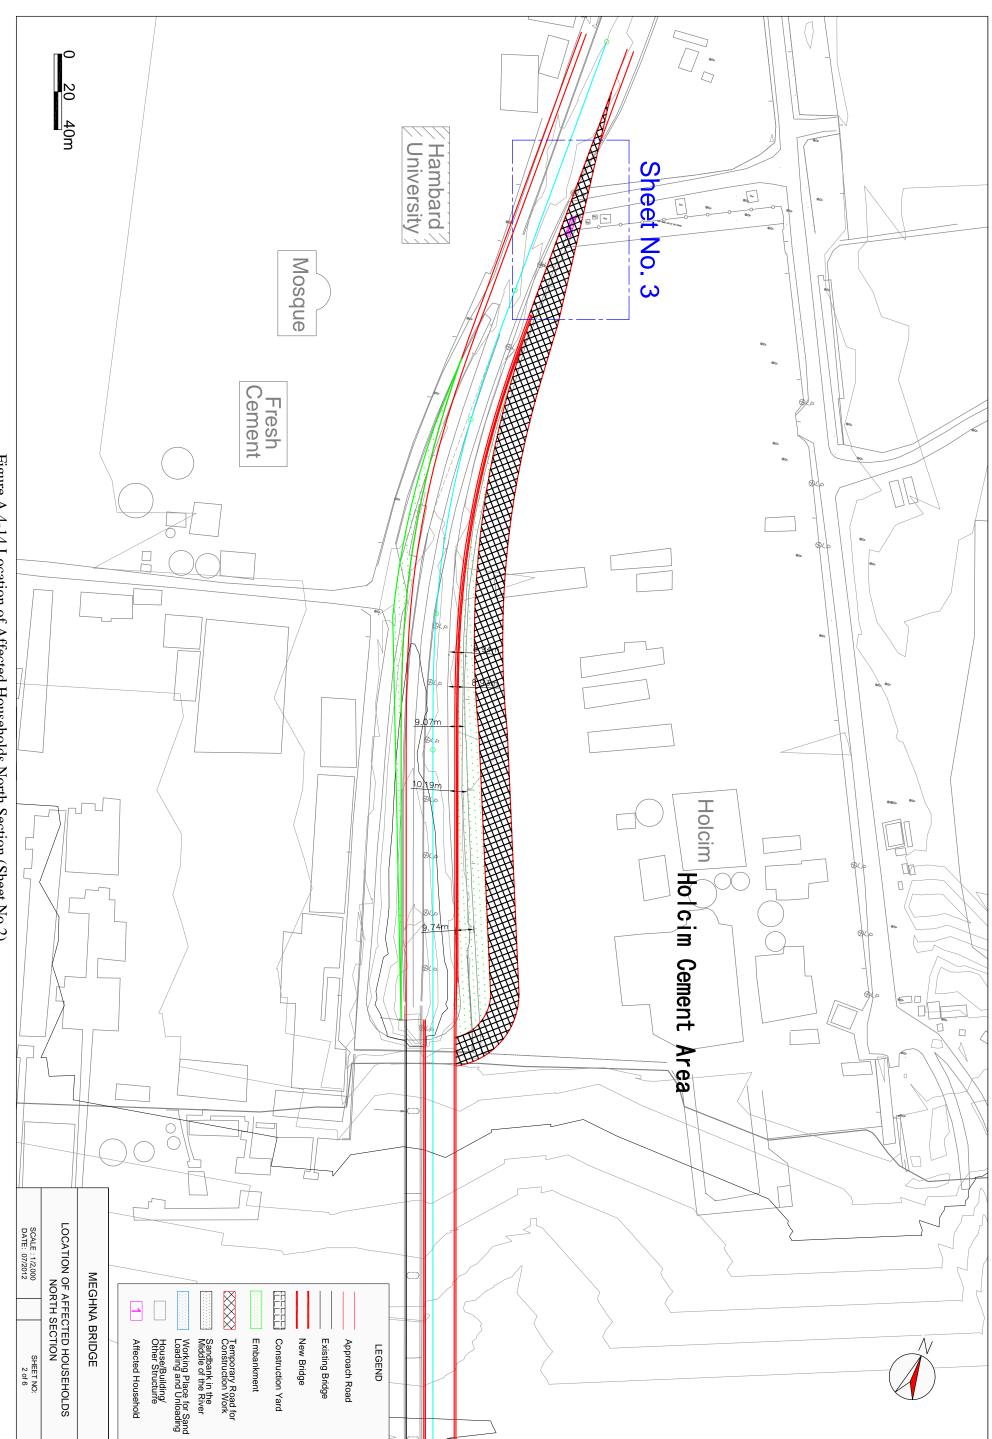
Location of Affected Households North Section (Sheet No.2)
